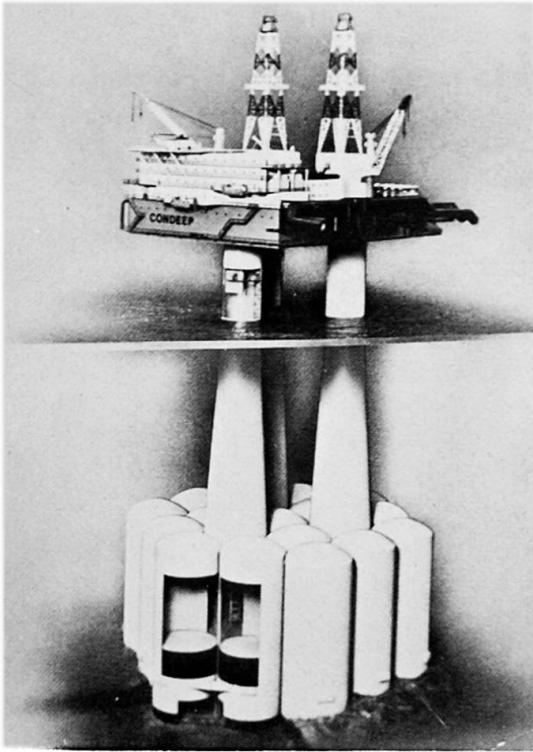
Condeep, Norway's multi-cell precast concrete oil production facility.
